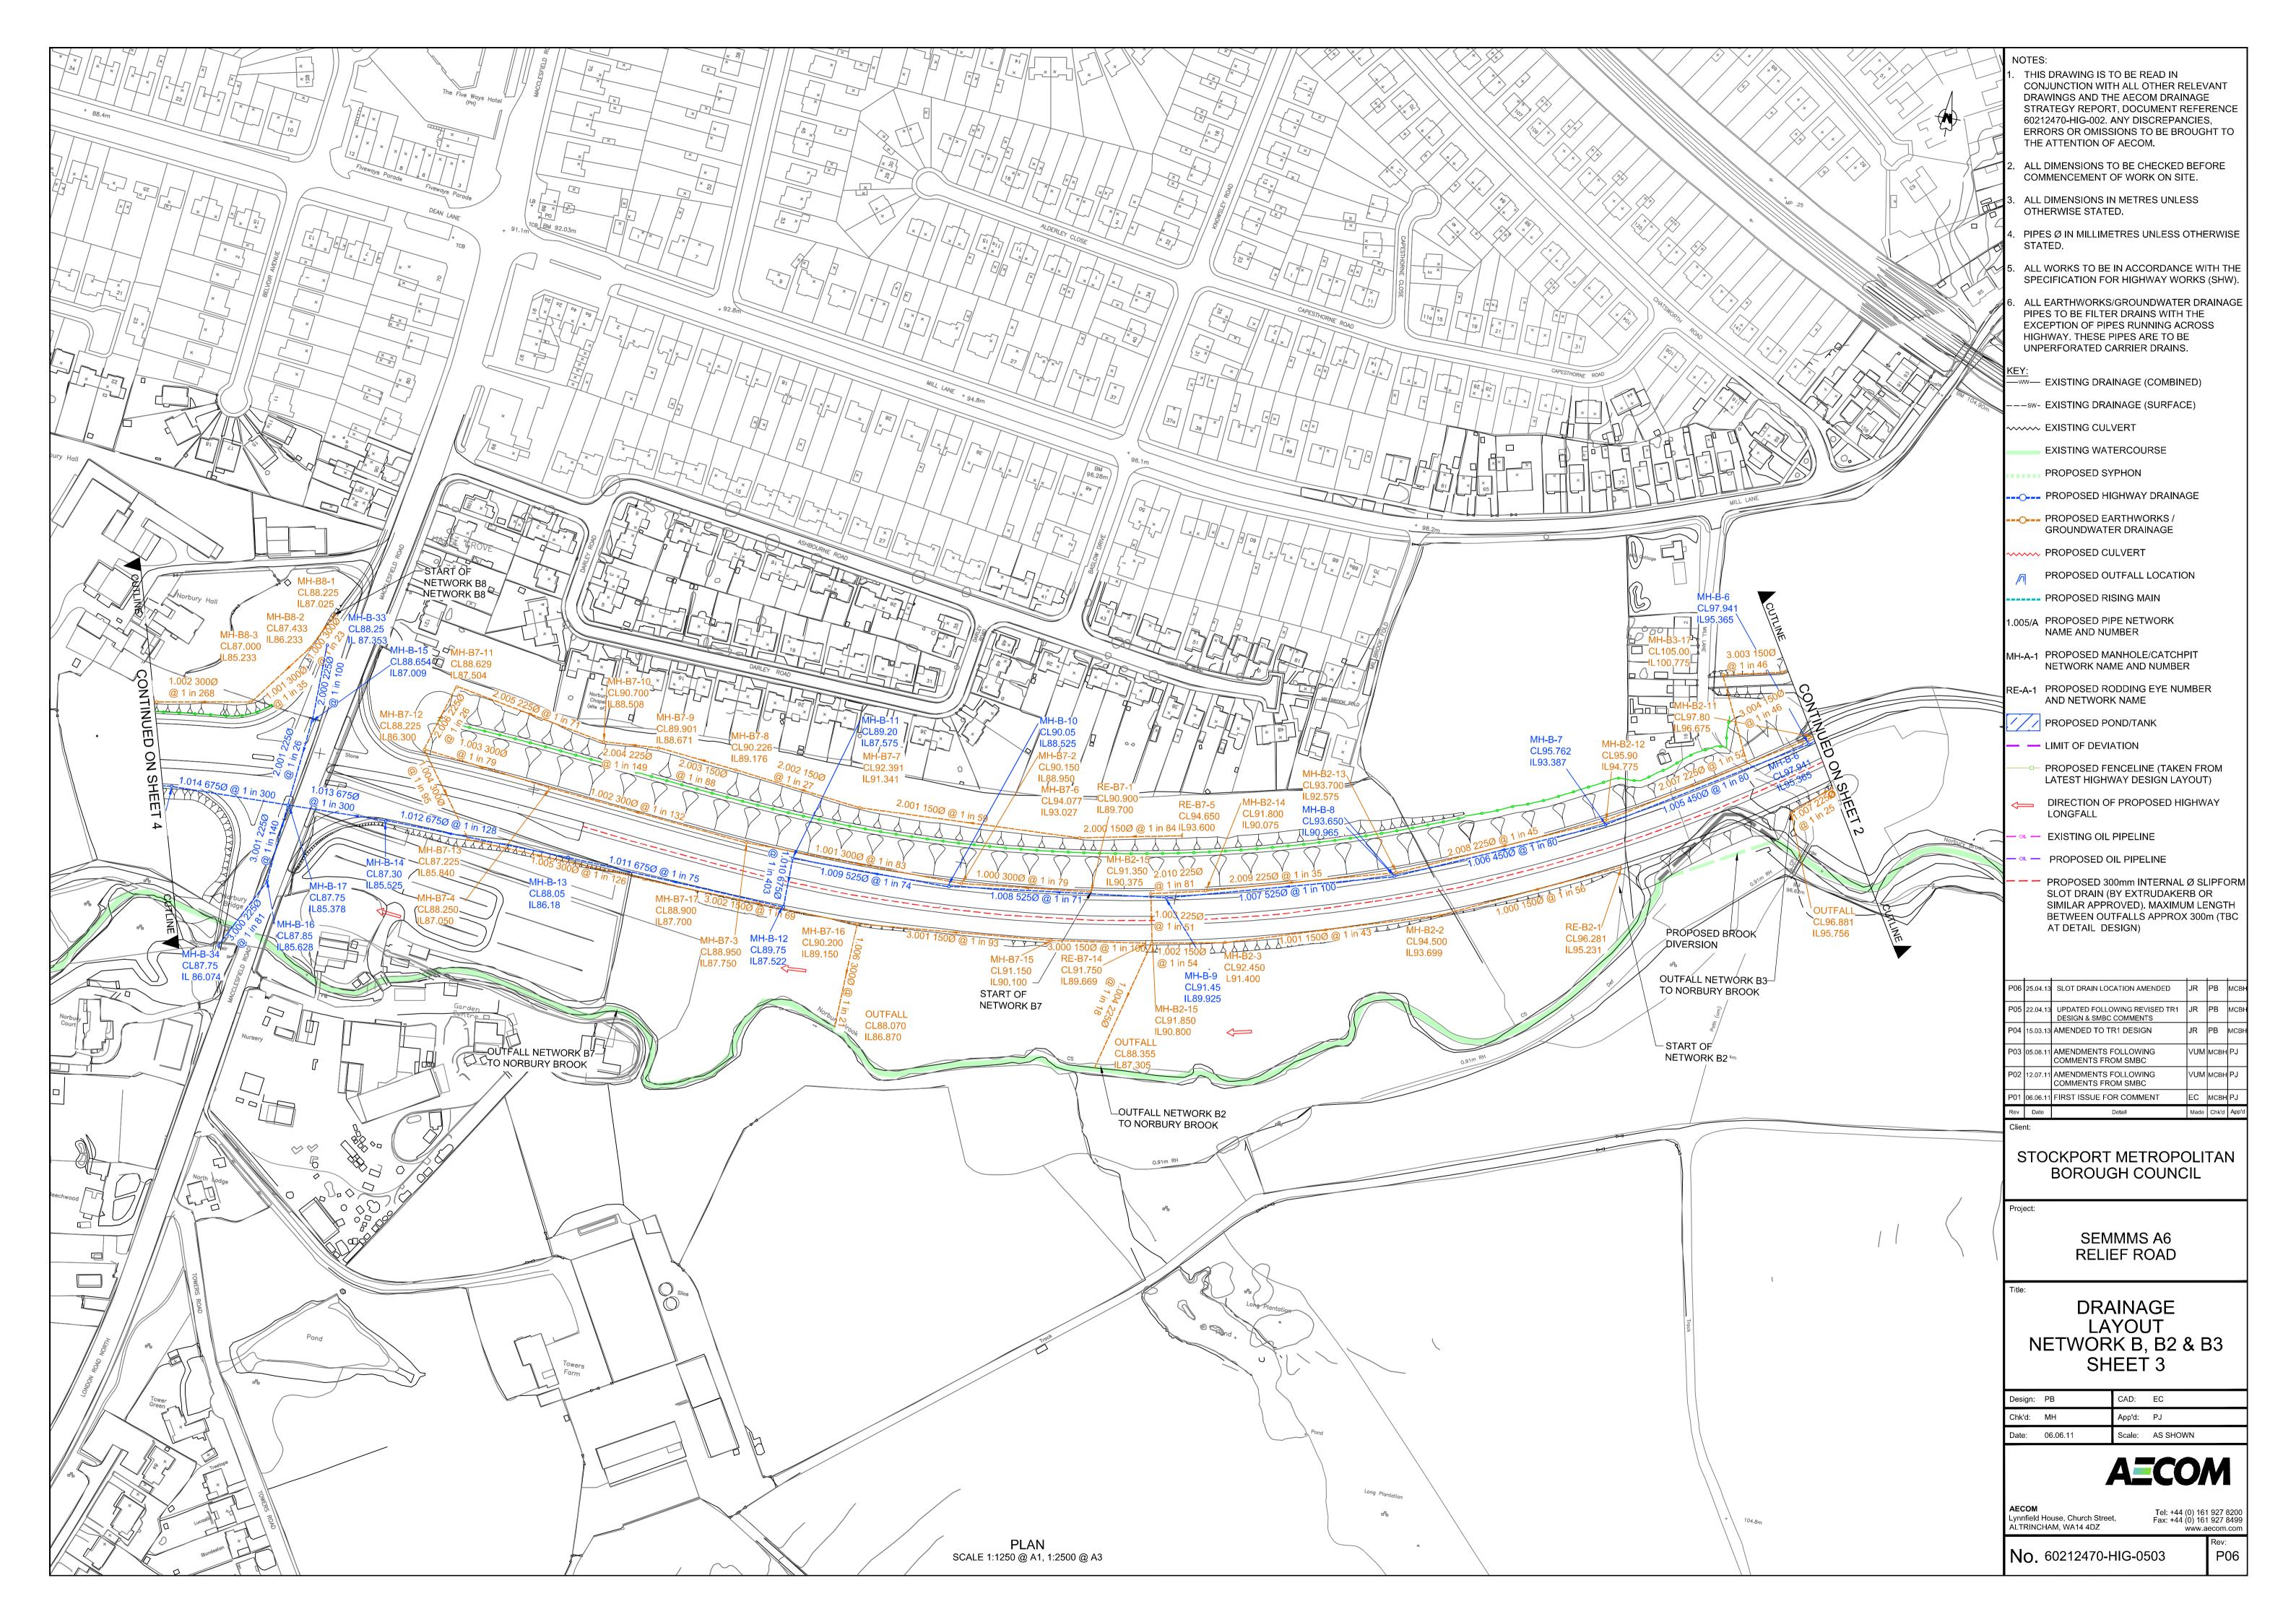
HIG-0501 to 0516: Drainage Layout Sheets 1 to 16
